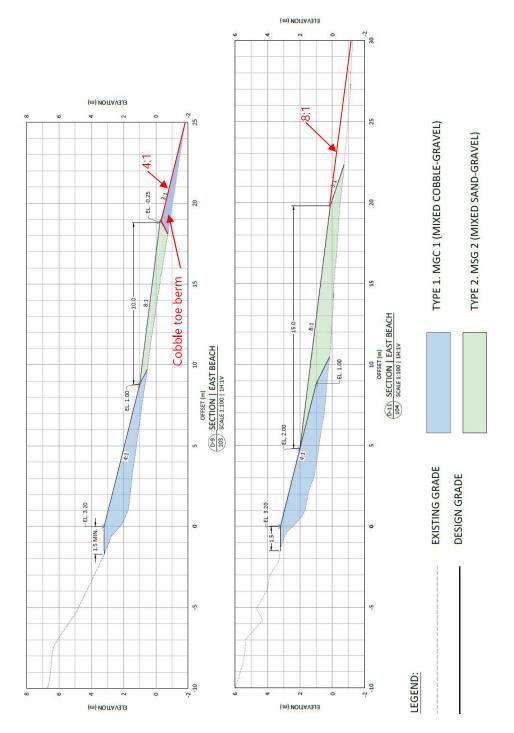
XBeach-G 1D sections for East Beach (top) and East Beach – Pocket (bottom) revised design sections. The revised design elements are shown in red.
